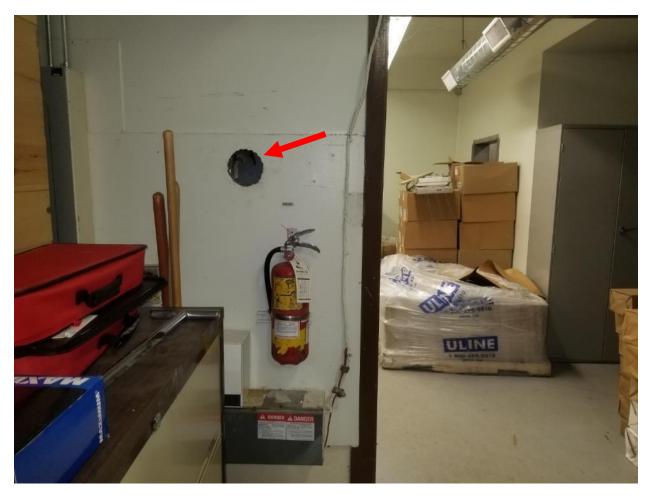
Ground floor, main room, north wall, <1 square metre fair condition Transite wall.
